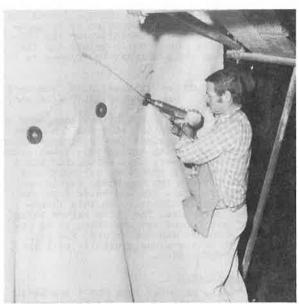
Fastening the non-woven protective layer to the tunnel wall
